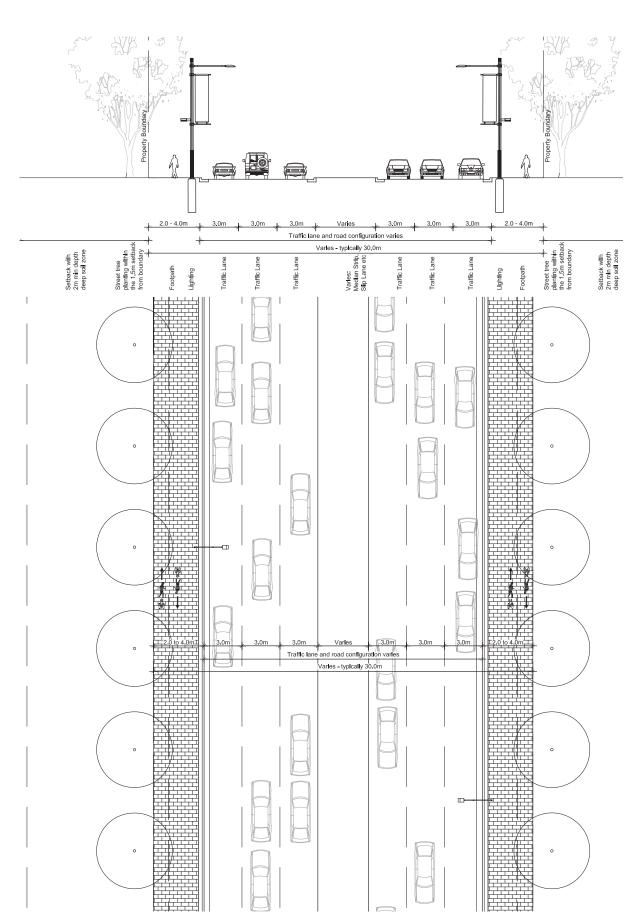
Typical Layout - Mixed Use, Commercial, or Business Character Street (NOT TO SCALE) e.g. Lane Cove Road - Typically 30 metres wide
